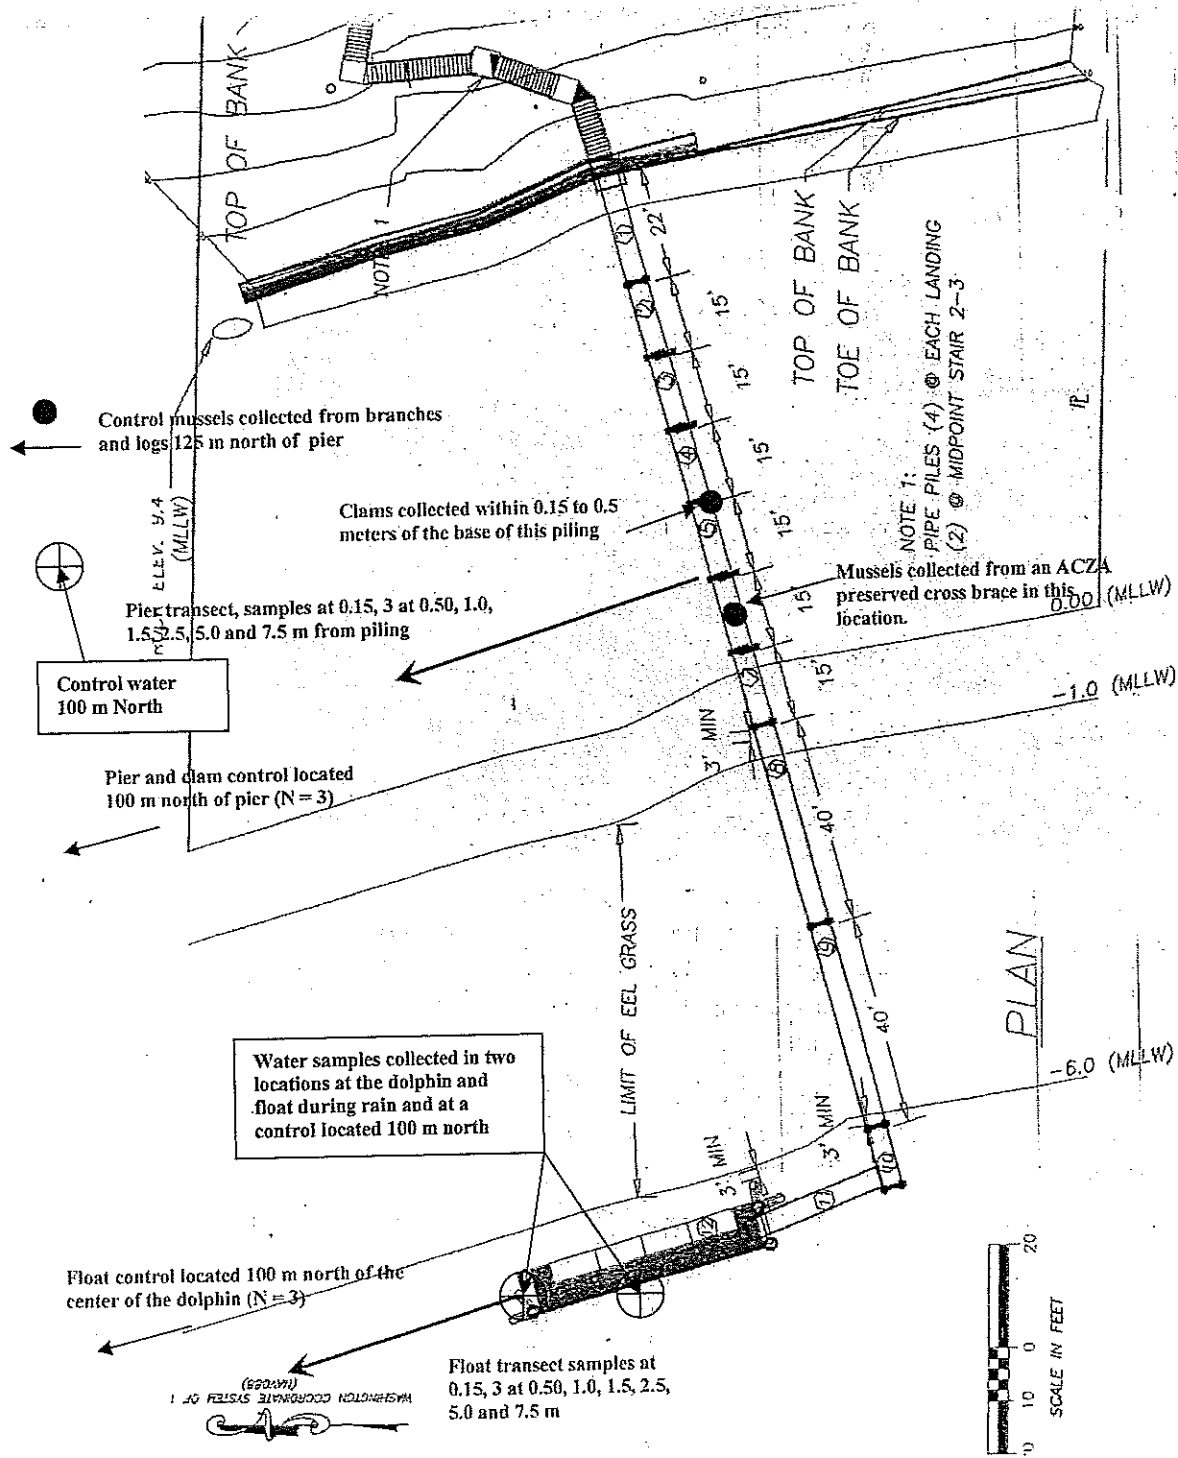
Plan of the pier and float located in Sequim Bay, Washington. The location of all sample stations is provided.
